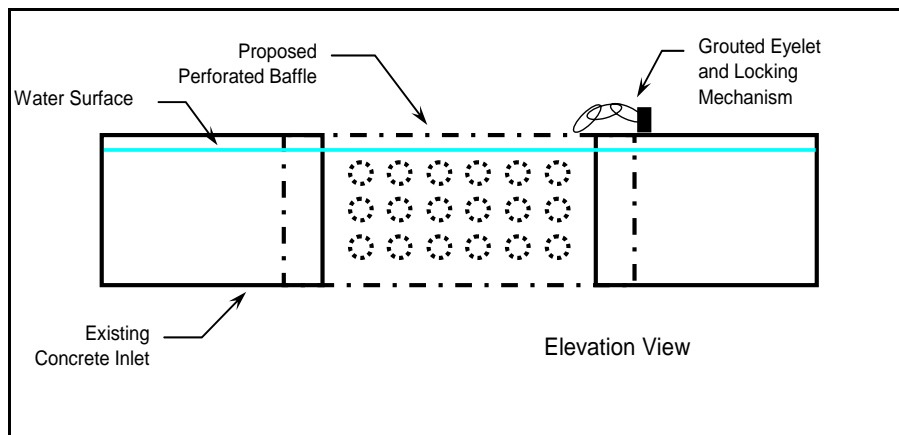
Elevation View of Proposed Baffle Wall for Sedimentation Chamber Inlet
